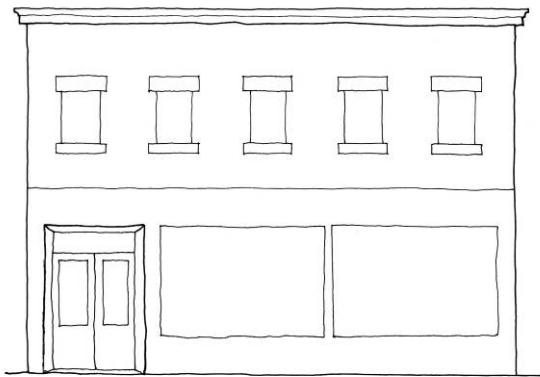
This façade has excessively large windows on the ground floor. The proportion of the windows does not complement the upper story windows or the door of the period style building.
